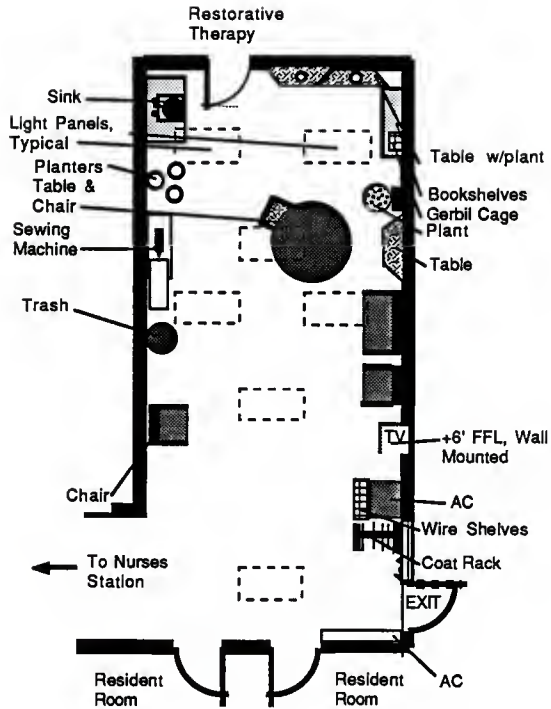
The Activity Room Plan. (Scale: 1/8" = 1' 0" North Δ).
